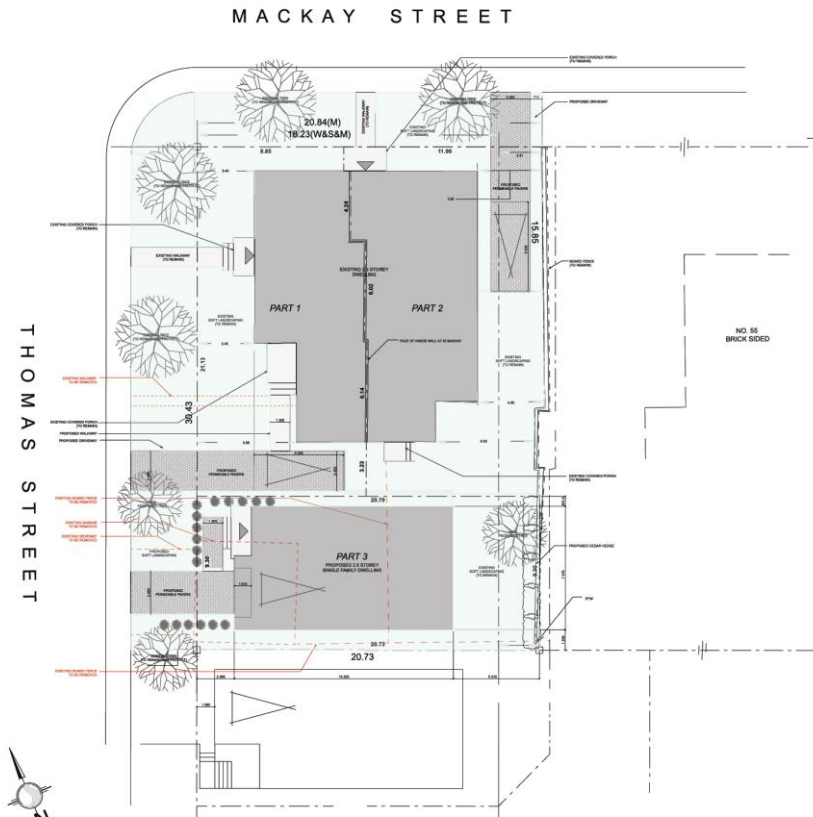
Site and landscape plan of the proposed development illustrating the existing and proposed built and landscape forms as well as the buildings on adjacent properties. The plan also illustrates the minimum rear and side yard setbacks, as well as the proposed front yard setbacks on Mackay St. Source: Ardington and Associates Design Inc. 2024.
